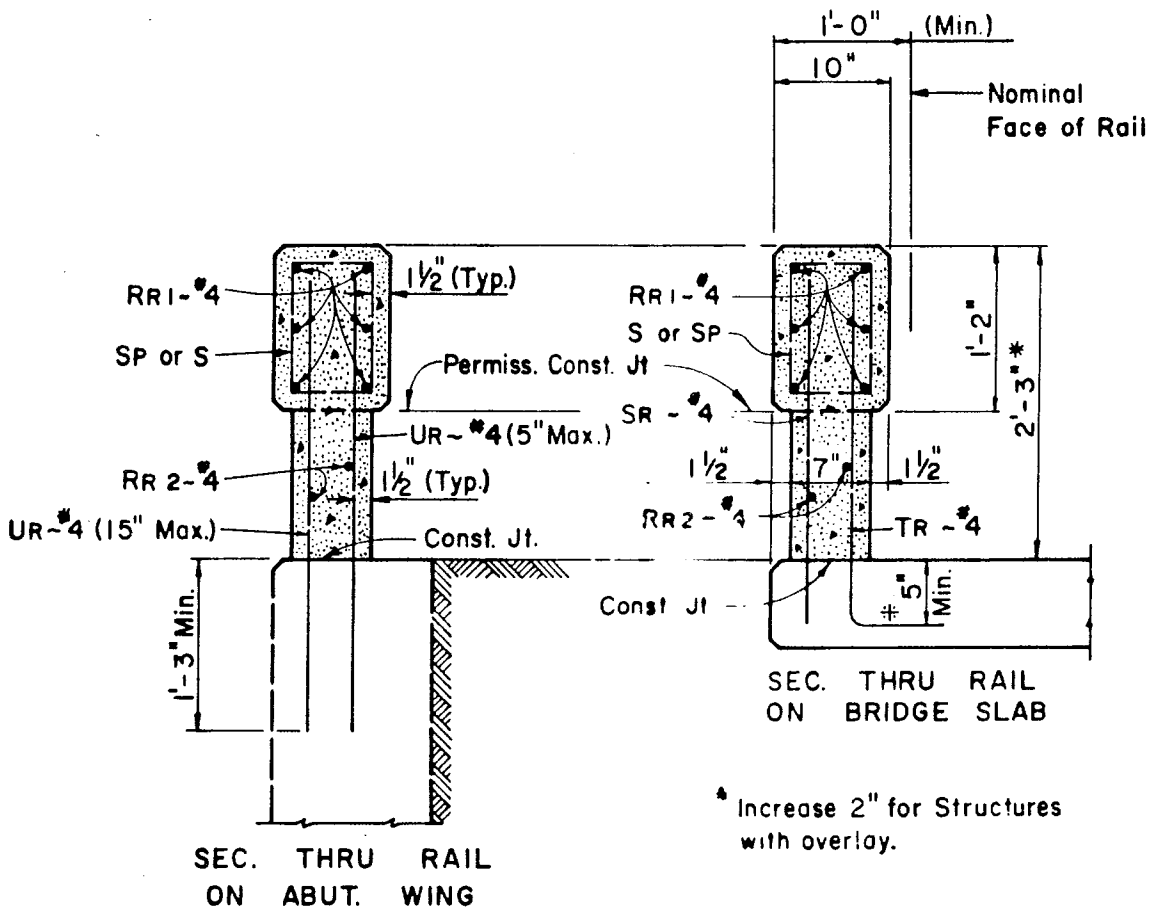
Texas T202 Concrete Beam and Post Bridge Railing (52,2).
